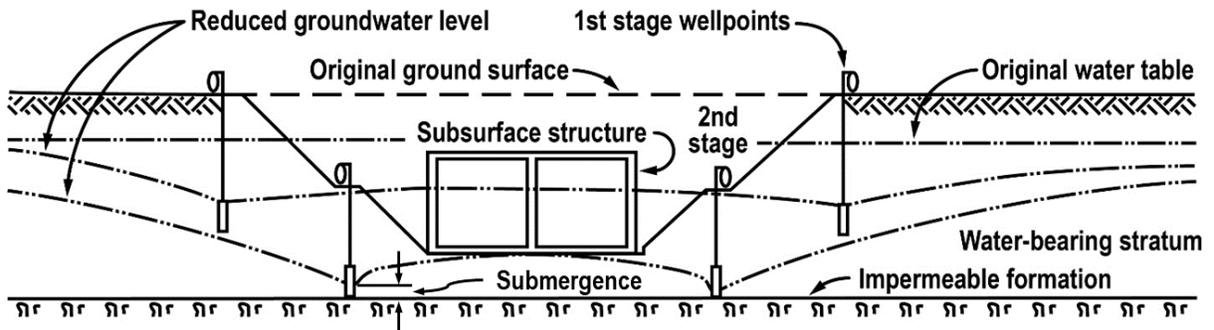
Plan of typical wellpoint system (Adapted from Leonards, 1962 and TM 5-818-5).
